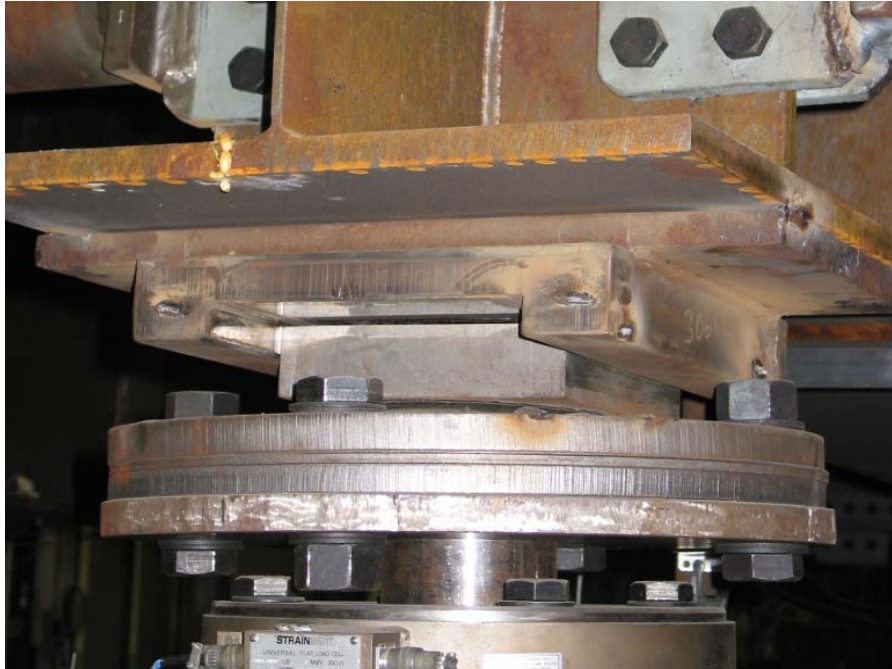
Guided bearing assembly arranged at the supports of the middle girder, G2, to provide radial restraints, courtesy of FHWA.
